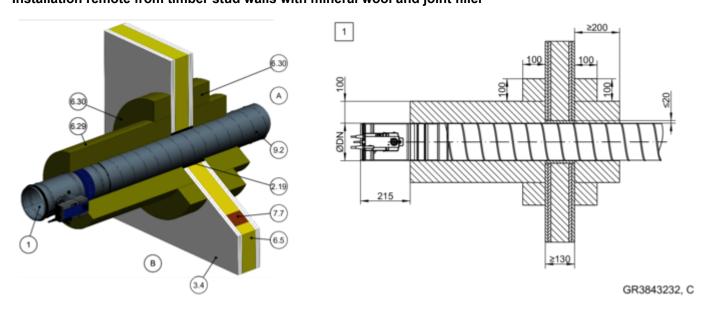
Installation remote from timber stud walls with mineral wool and joint filler
